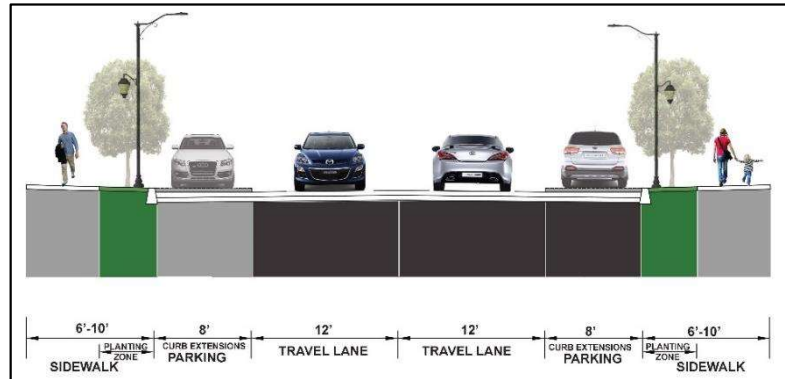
5th Ave Concept Cross Section (Haven to Greene)
